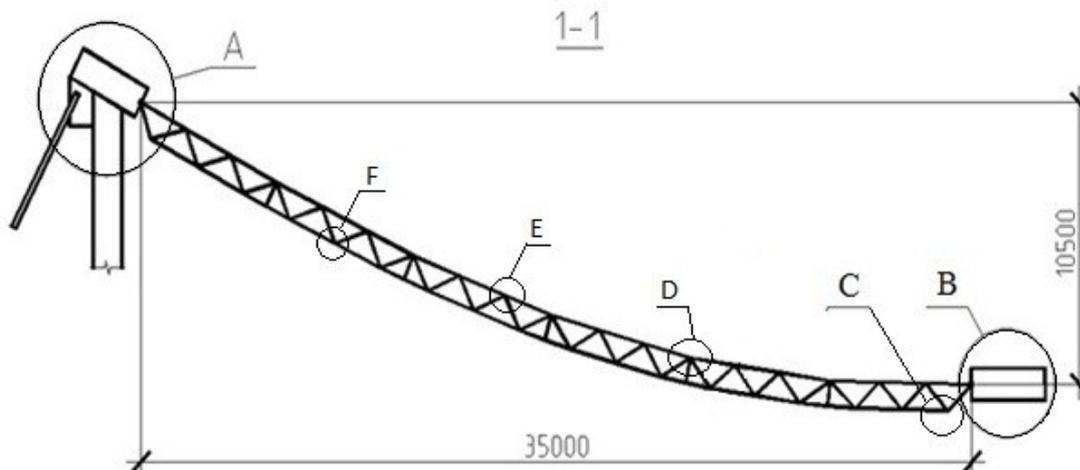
Structural schematic drawing of spatial and rod roof. Open-cut mine 1-1
